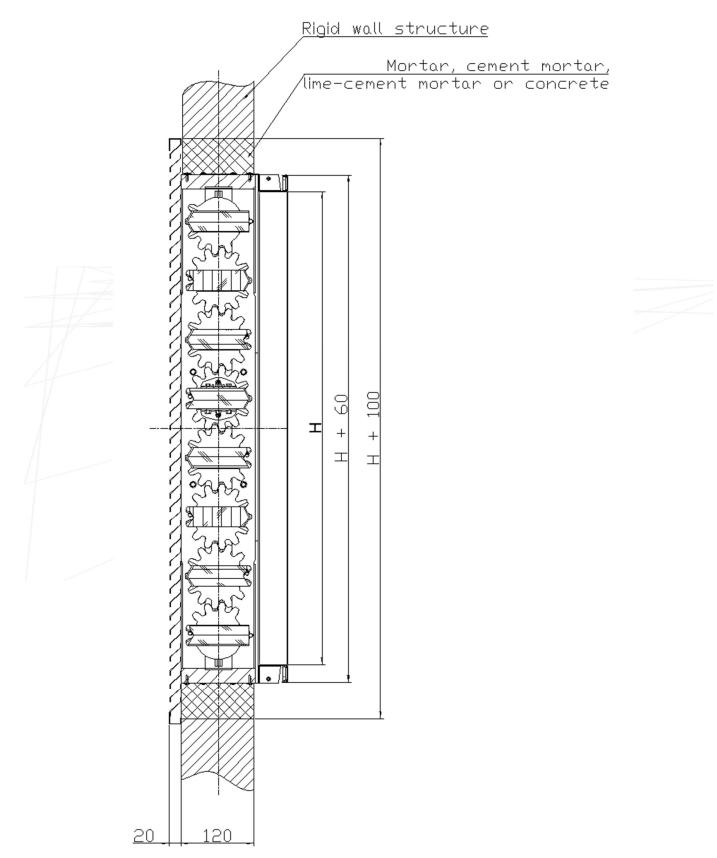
Installing method of WKP-P fire dampers in rigid wall
